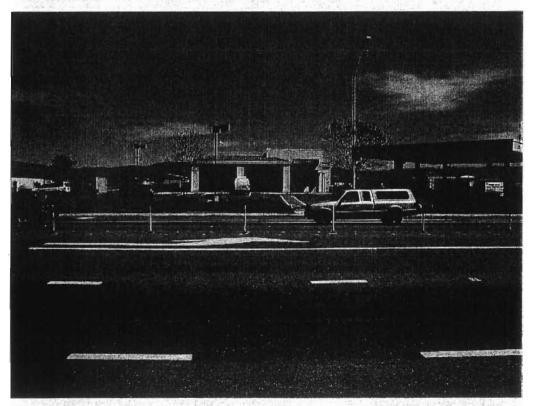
View across N. Vasco Road at the east adjoining Quick Stop gasoline station.
